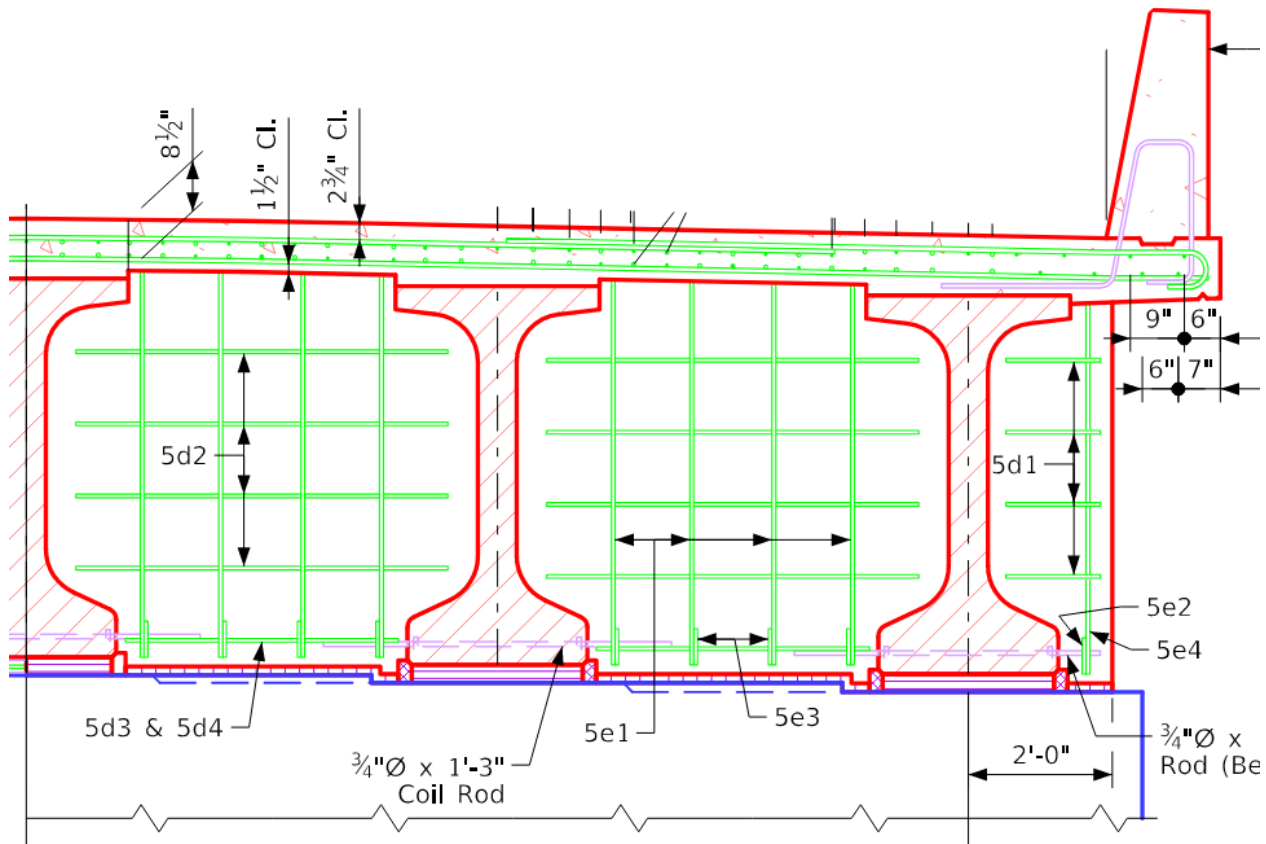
Partial cross-section of bridge deck for a 30-foot roadway. Excerpted from standard sheet 4380-BTE-5, dated July 30, 2024. Epoxy-coated reinforcement is shown in green; stainless steel reinforcement is shown in magenta.
